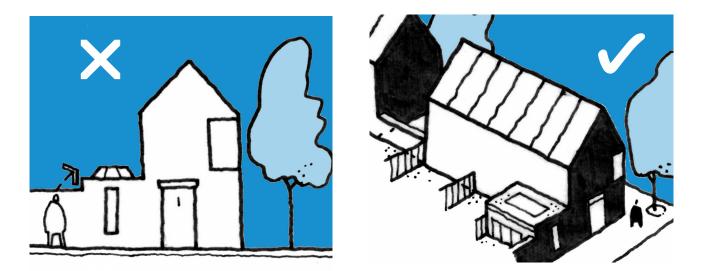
In most cases, flat roofed rear extensions are preferable to pitched roofs. Where sky lights are proposed on flat roofs, these should be flat and level with the roof. Lantern-style sky lights are not permitted.
